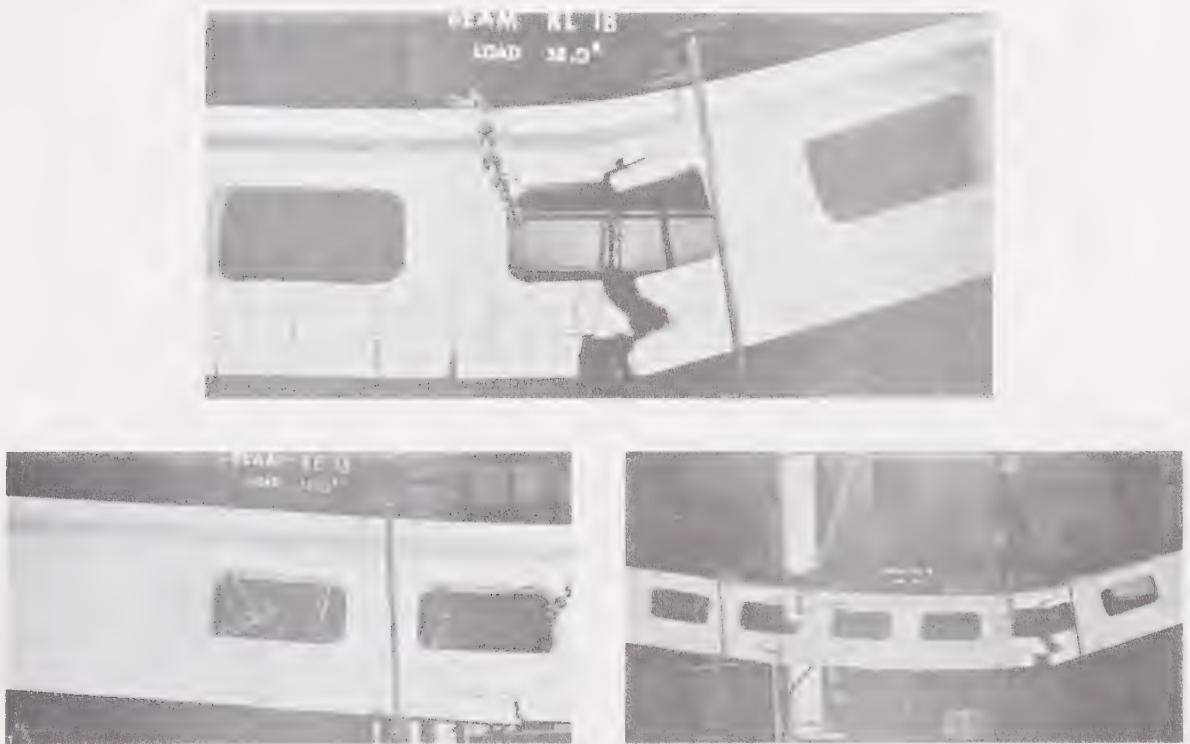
CRACKING AND FAILURE PATTERN OF BEAM 18-16-4
